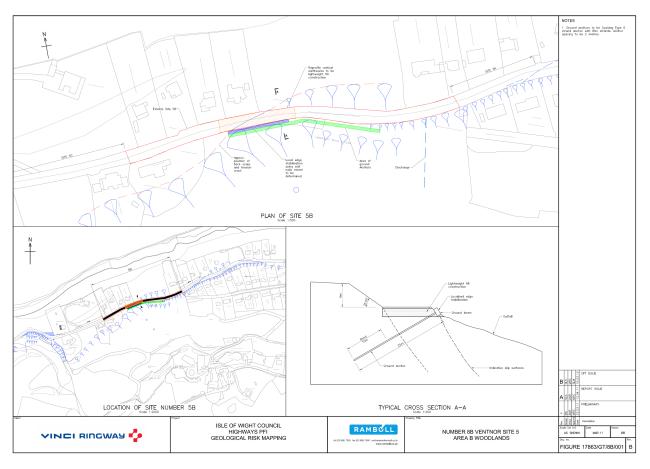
Proposed engineering solution at Undercliff Drive Area B
